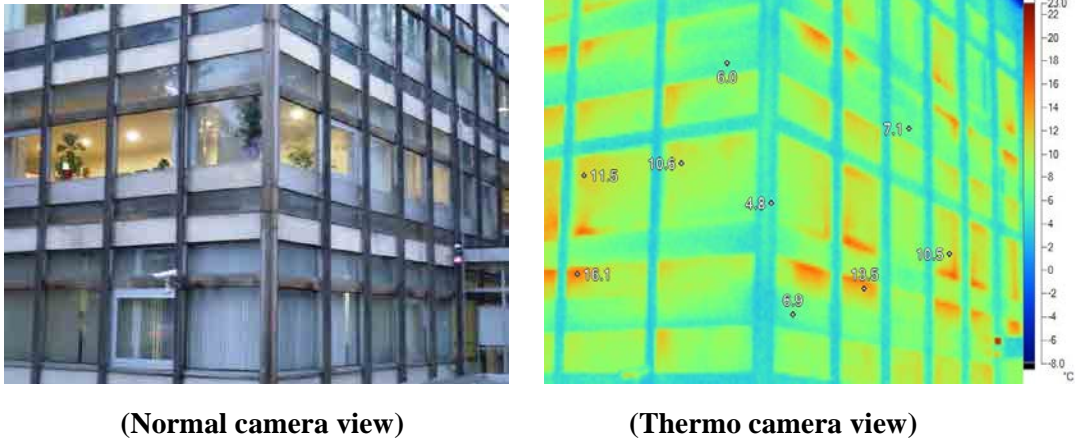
Heat Loss through Windows and Walls in DSI Buildings
